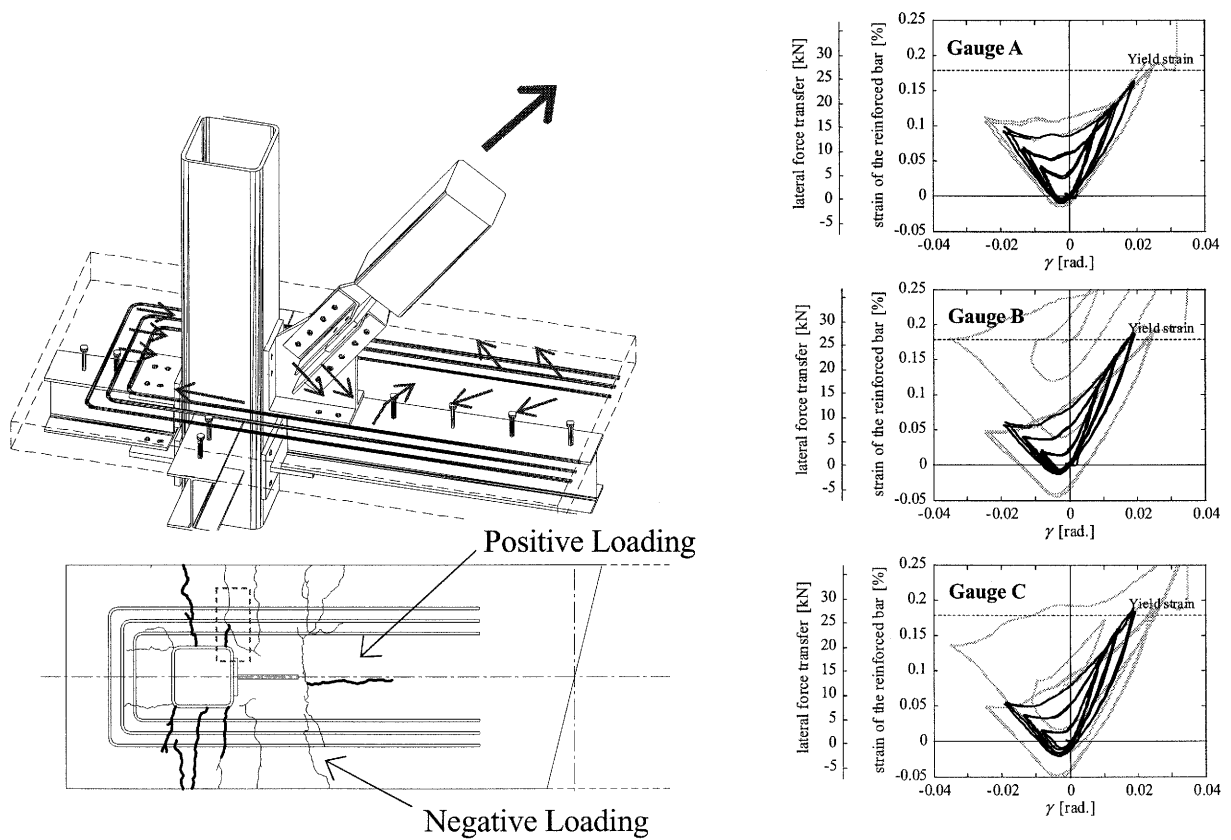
Damage to Concrete Slab and Behavior of Reinforcing Bars (First Floor)
